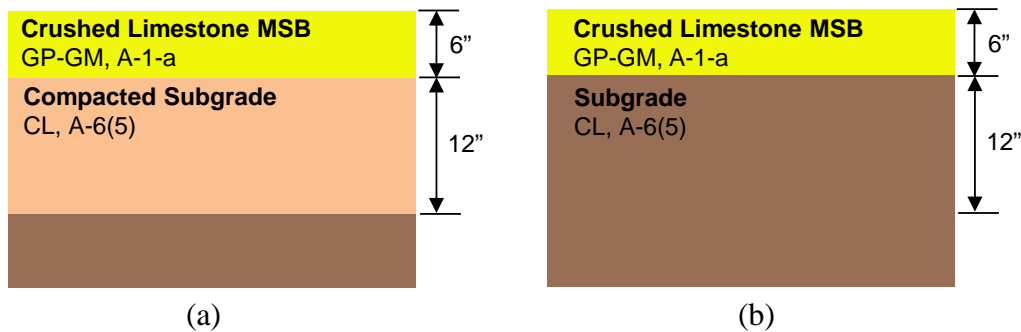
Pavement foundation profile on: (a) 10th St. North (compacted subgrade), and (b) 10th St. South (control)
